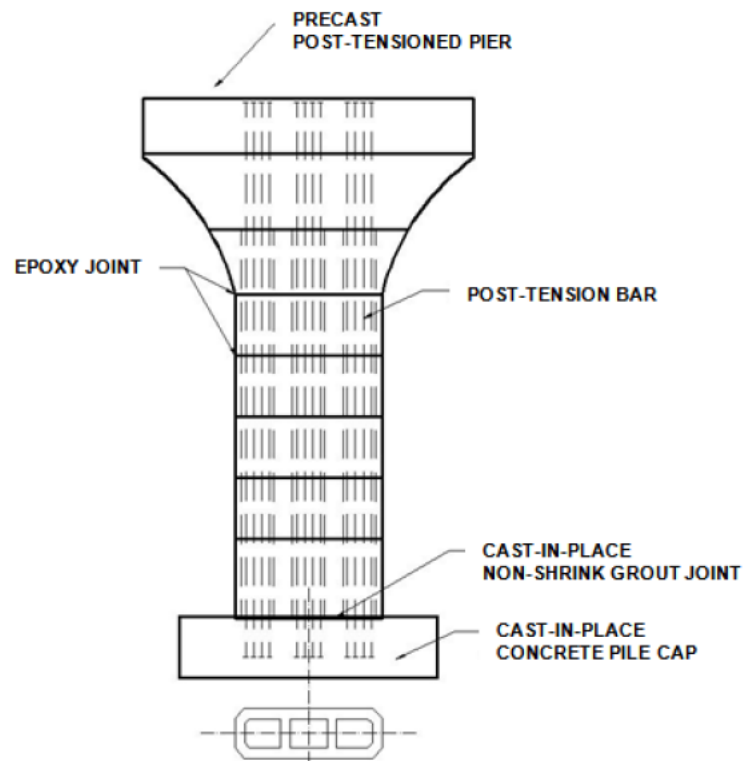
Vertical connection of precast post-tensioned pier (FHWA 2009)
